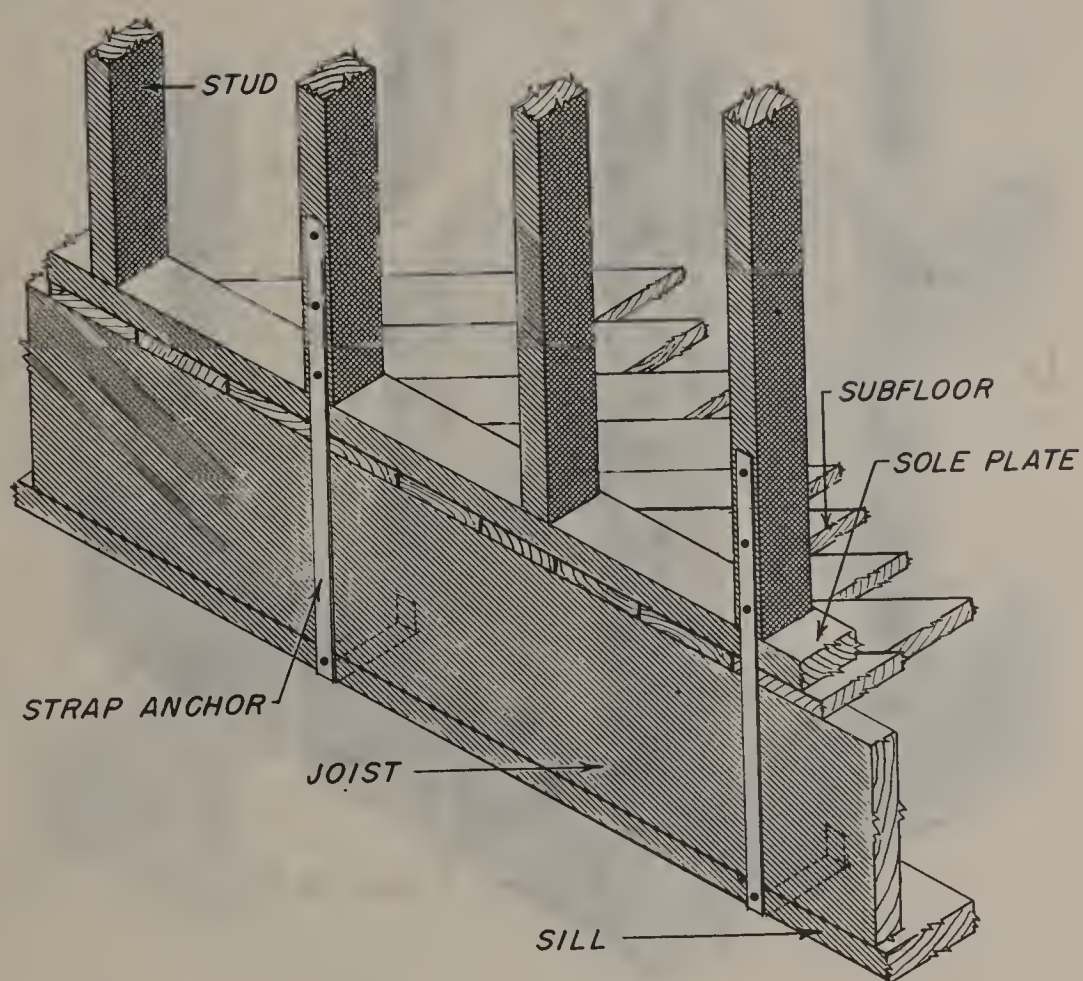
Metal strap anchorage of studs to sill. Strap not less than 22 gage (0.028 inch) in thickness by 1 inch wide nailed to inner and outer edges of sill with one nail, and to outer face of alternate studs with three eightpenny nails. Note: Such anchorage is not needed if diagonal boards or plywood is used as wall sheathing and is nailed as shown in figure 32 or figure 34.
